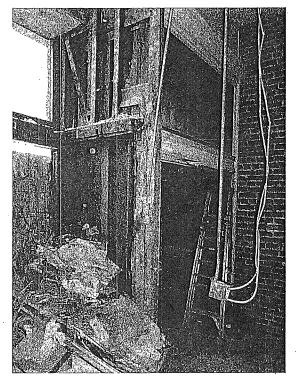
Interior view of 353 Kearny entrance, looking southeast. Note entry vestibule with wood and glass transom above double-door opening (photograph taken on 04/02/2018).
